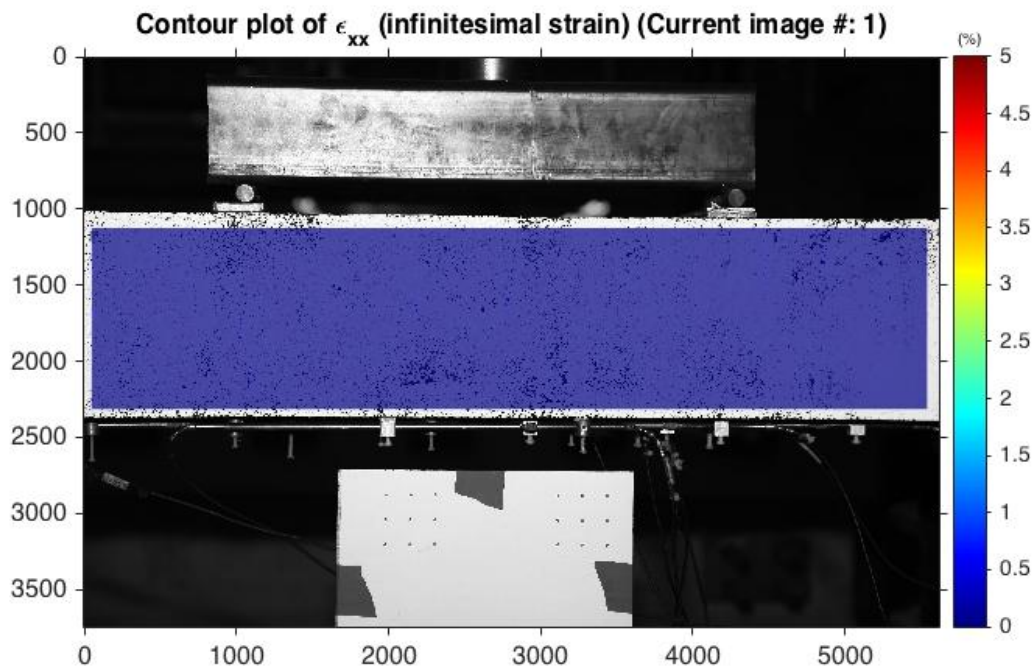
DIC image under 0 kN of Test 01, beam with SHCC layer of 30 mm
